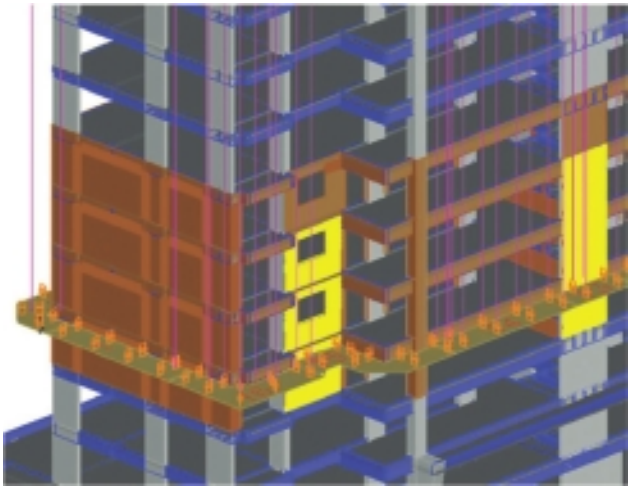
A view of structure, masonry and platforms for cladding execution.
